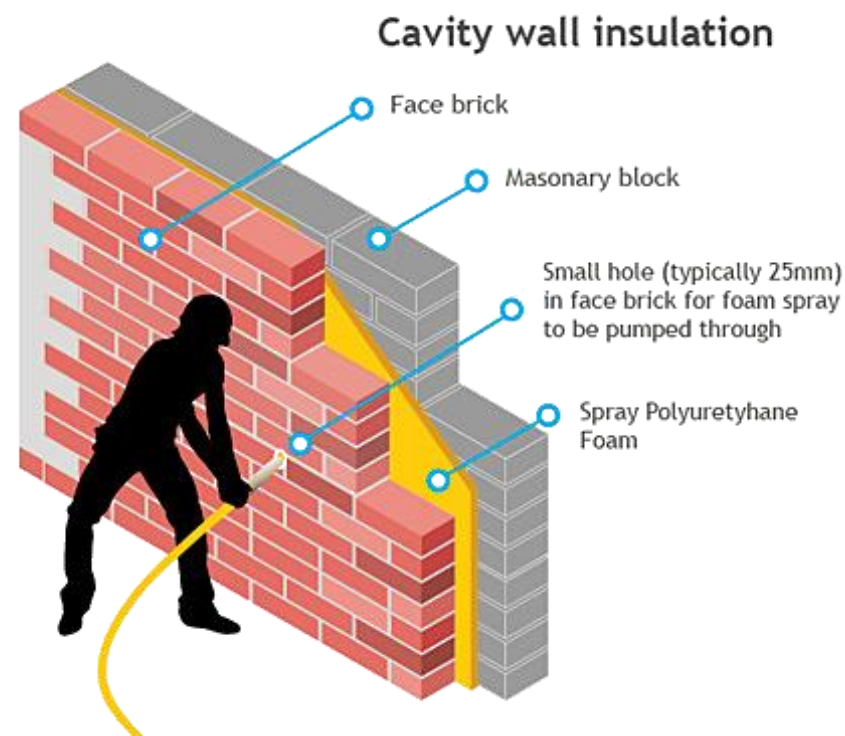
Cavity wall insulation procedure. Works IMBG, 2014.
